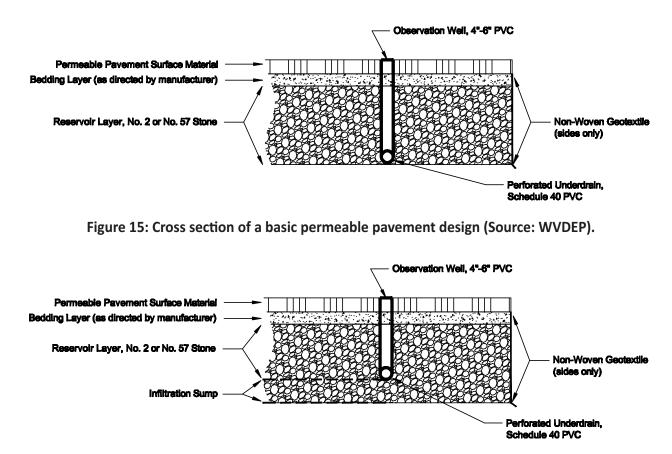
Cross section of a basic permeable pavement design with infiltration sump (Source: WVDEP).
